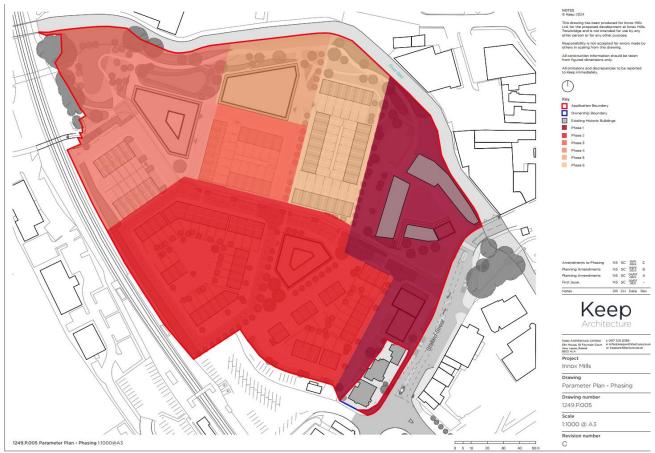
Parameter Phasing Plan (1249.P.005 Rev C)
